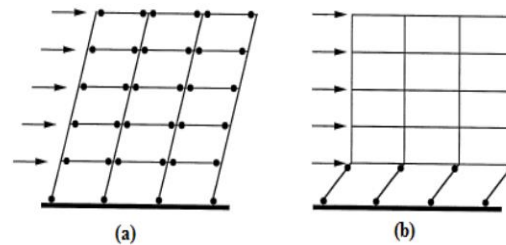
Mechanisms of Strong Column Weak Beam (a) and Weak Column Strong Beam (b)
